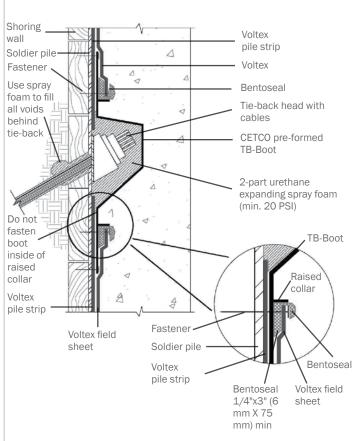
TIE-BACK DETAIL - Install TB-Boot centered over tie-back then install Voltex with Bentoseal detailing. Do not fasten boot inside of raised collar around center formed area
